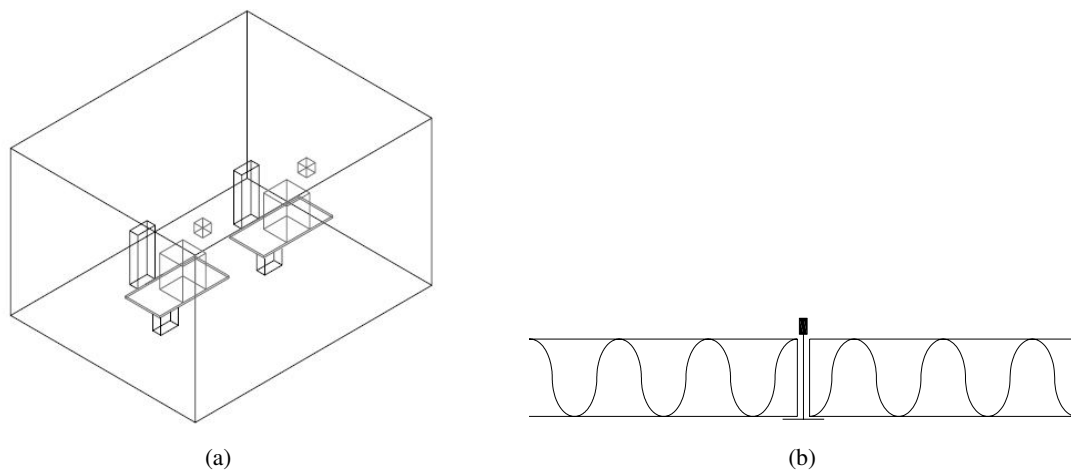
Pictures showing a) scheme of the test room set-up used in the full-scale measurements, b) connection of two stone wool insulating panels used in the ceiling's construction. [Jakubowska 2009]
